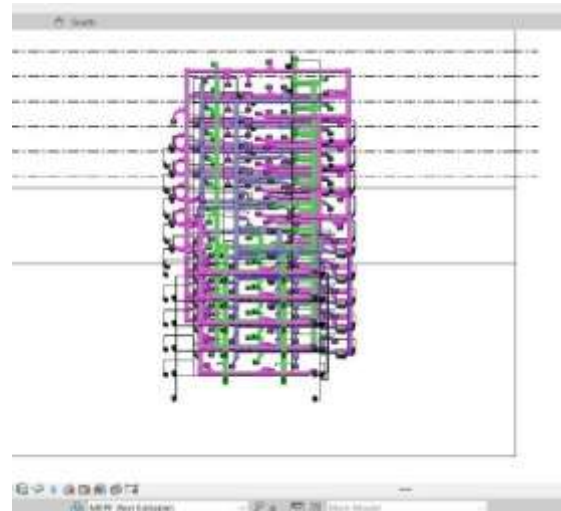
MEP pipe network- Elevation South of all 6 floor vertical rise and floor level row horizontal rows
